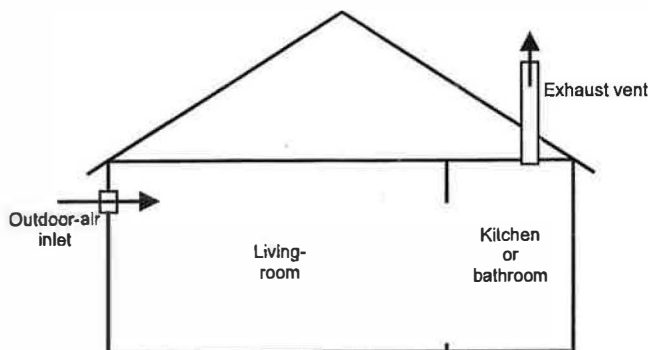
Sketch of standard Danish single-family house with natural ventilation. The outdoor-air inlets are normally placed at the same height as the top of window frames.
